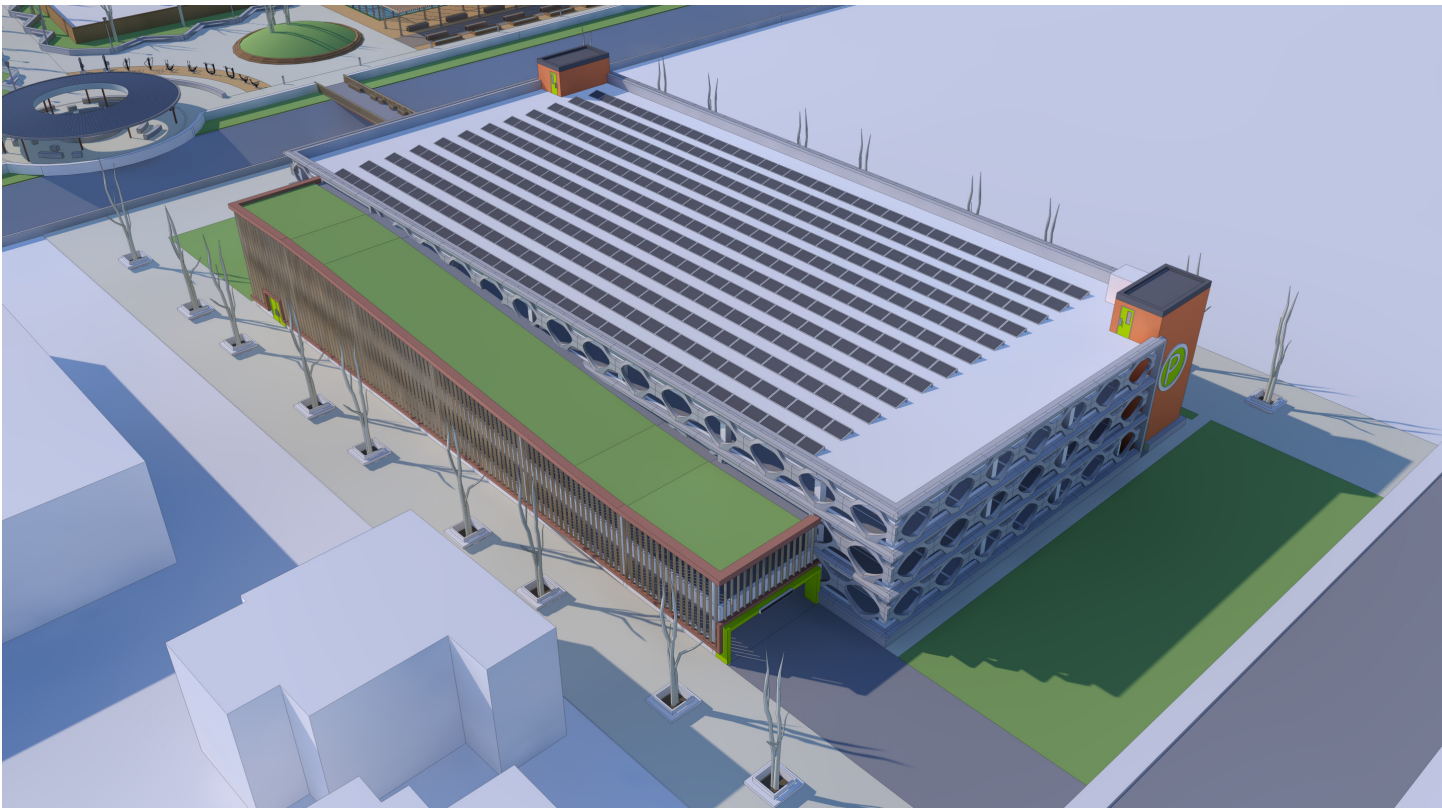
Aerial view of the Mill Creek Gardens parking structure, showing its green roof and rooftop photovoltaic array.
